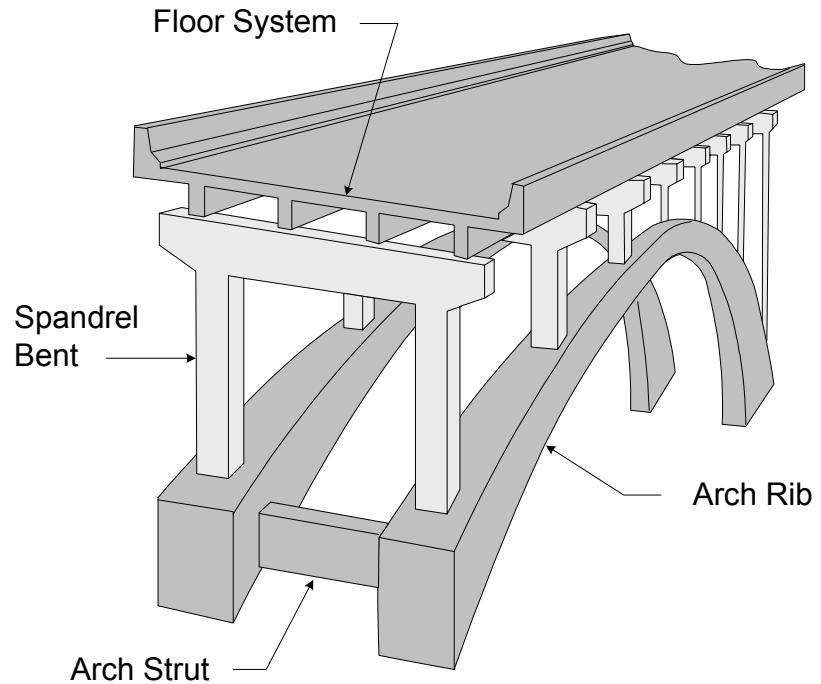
Primary and Secondary Members of an Open Spandrel Arch
